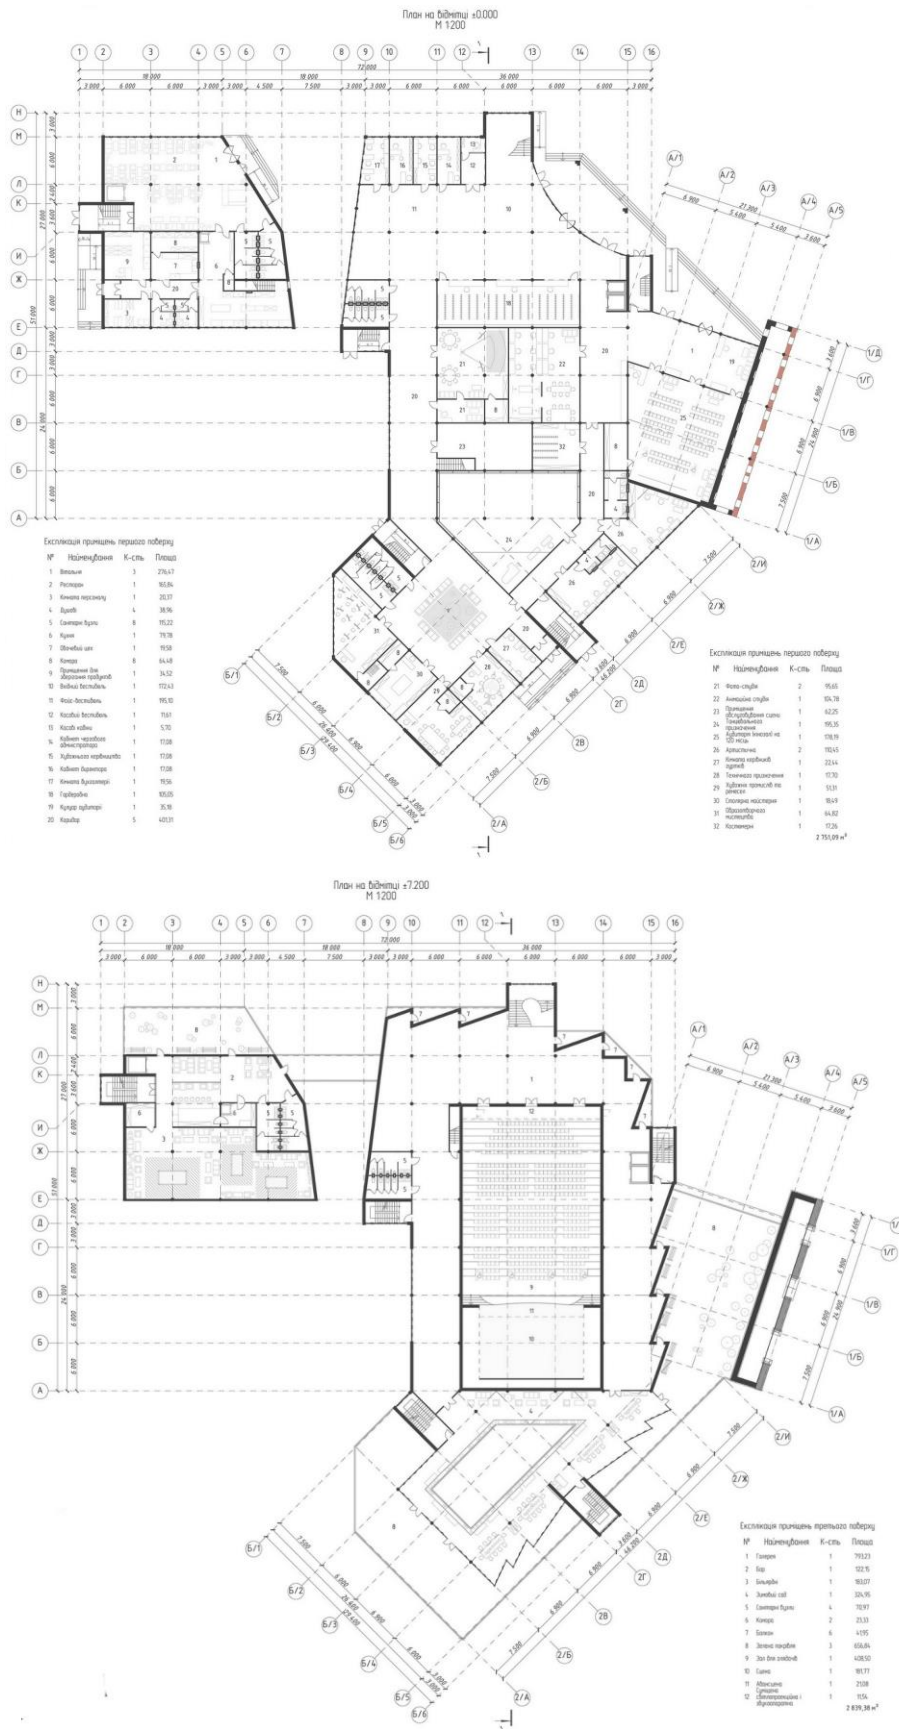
Floor plans of a cultural and entertainment facility (example)
